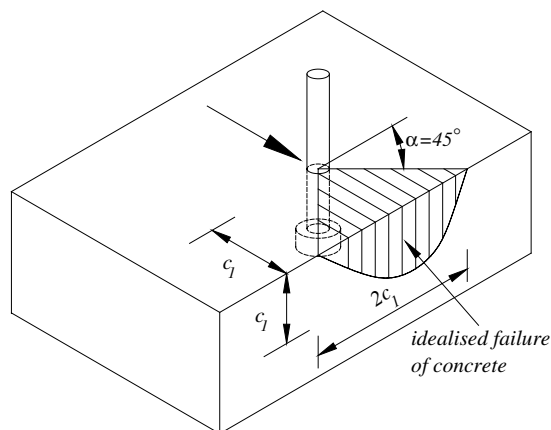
Idealised concrete breakout cone of anchors in shear [15].
